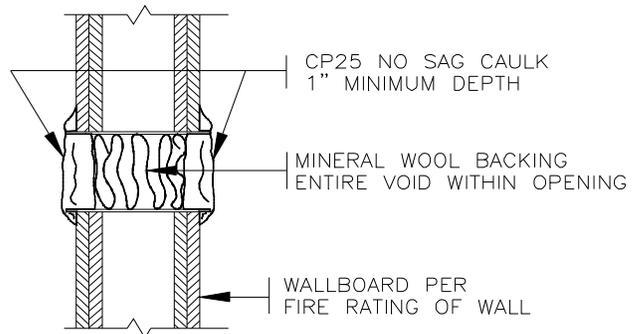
FIRE STOPPING VOID CIRCULAR OPENINGS IN FLOORS AND WALLS (UL WL-3031 EJ)
